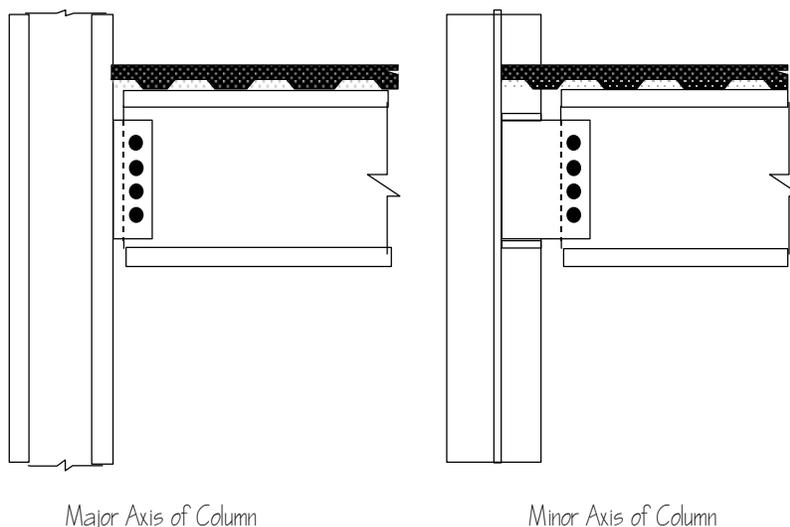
Typical Simple Shear Tab Connection with Slab
